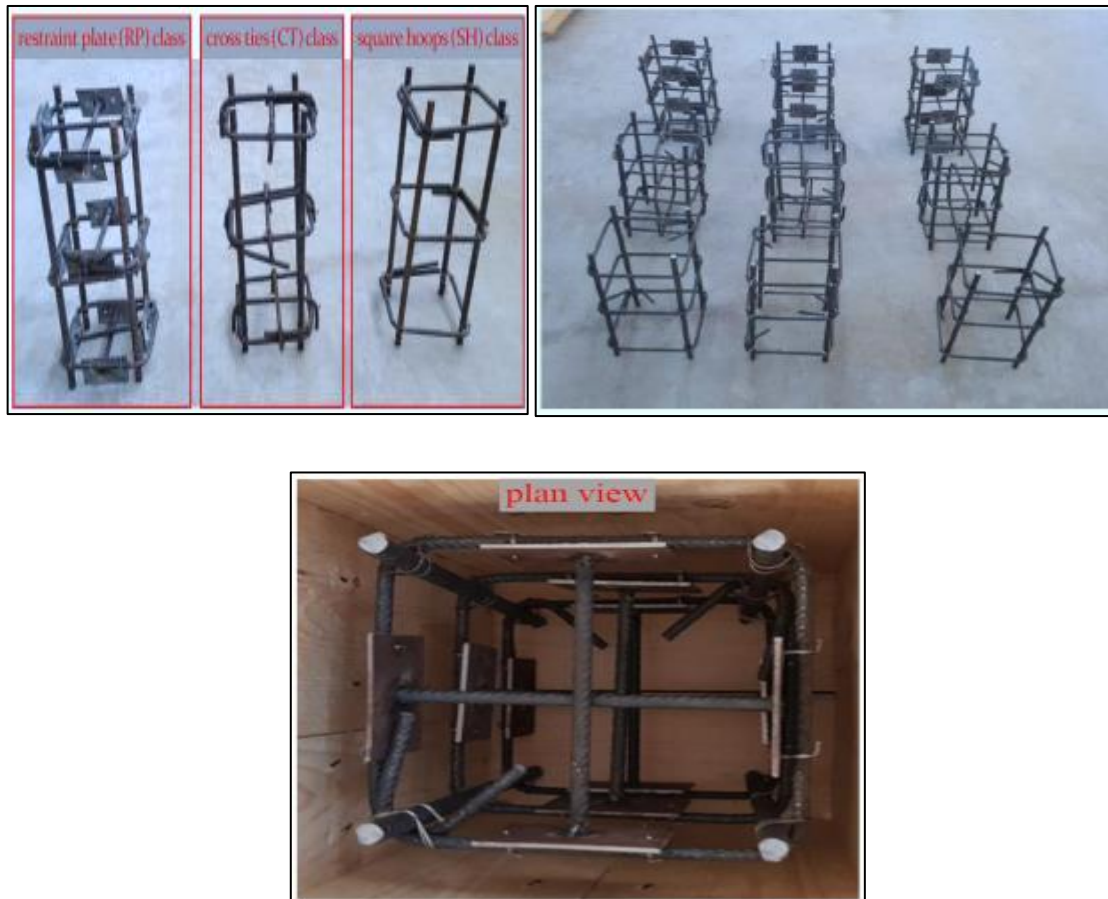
8 Geometry of the specimens and transverse reinforcement configuration by Dario [23].
